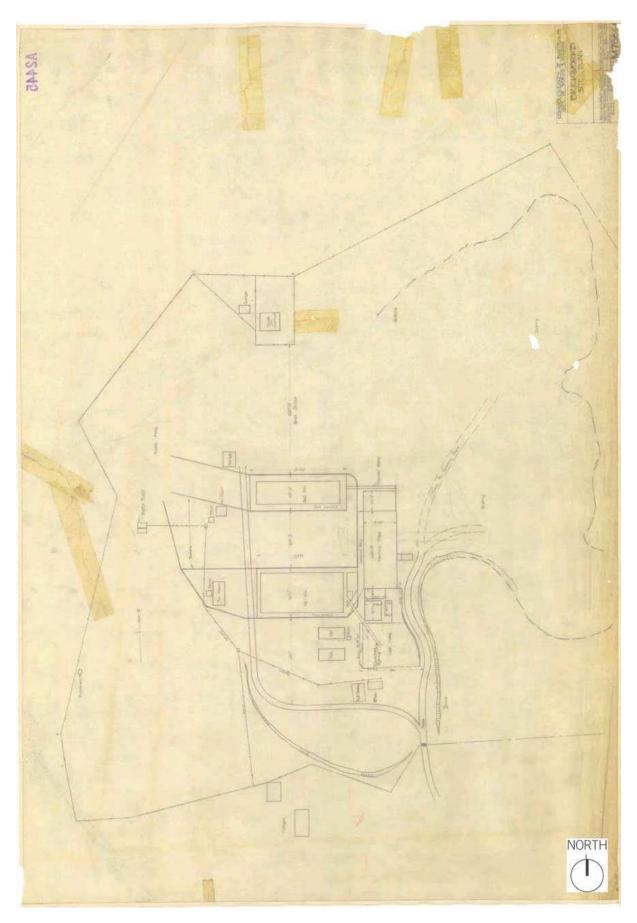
Site plan, 1947. (Source: National Archives of Australia, A2445, M7668A)
